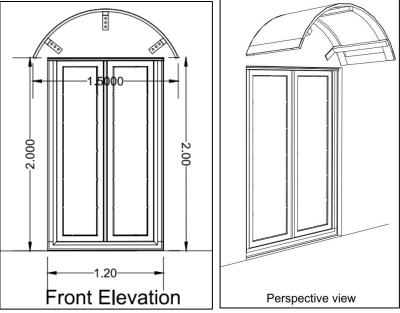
Amended front elevation signage with existing grey colour scheme being retained
